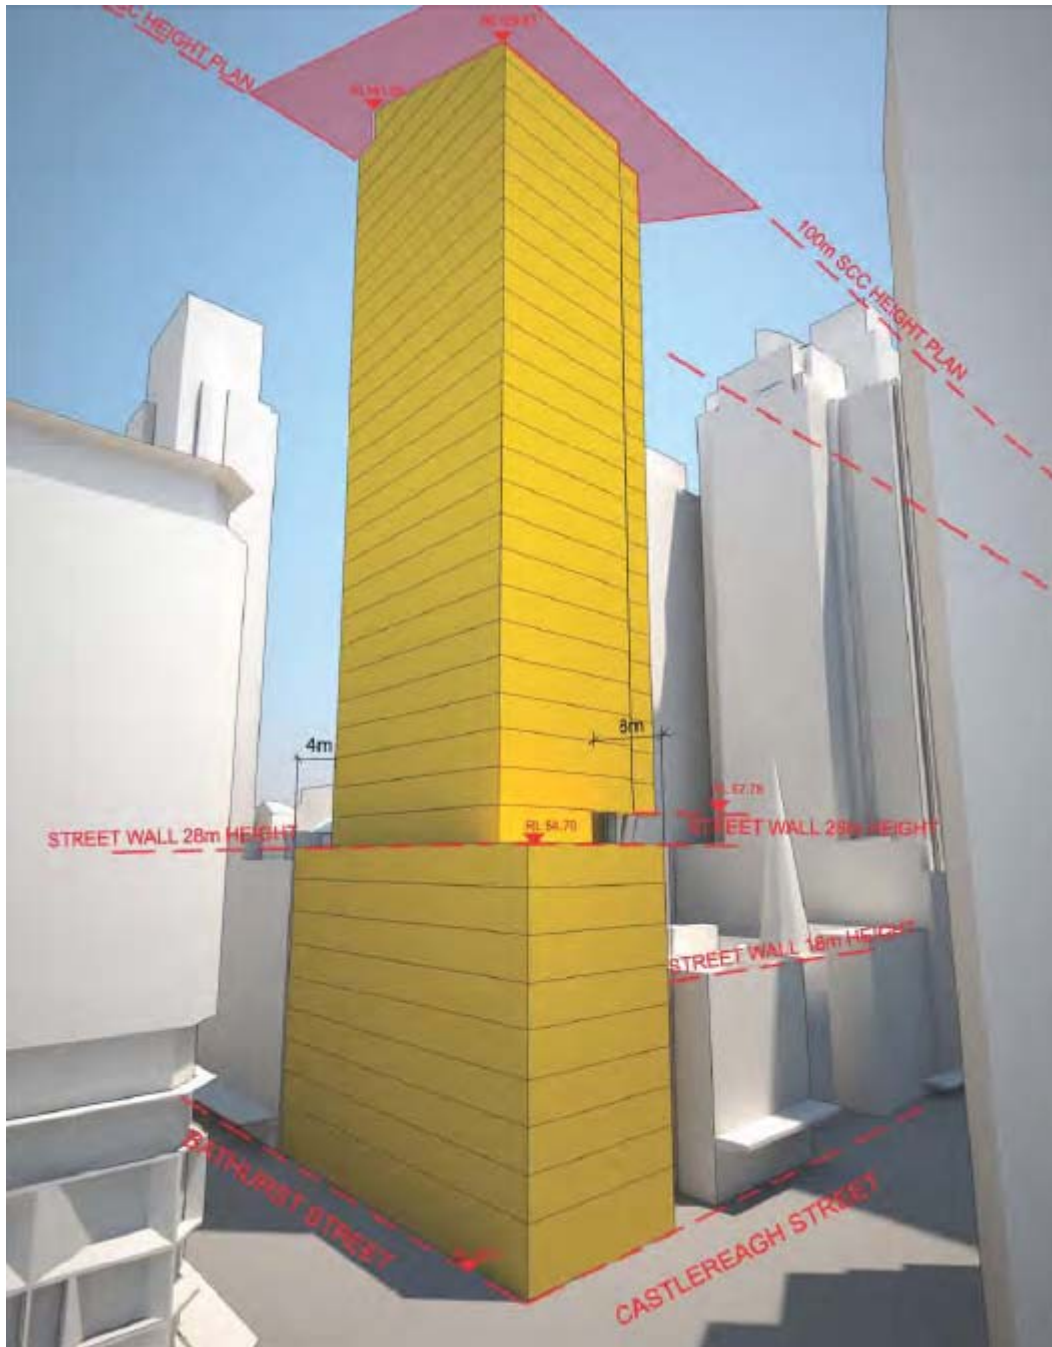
Proposed building envelope, viewed from opposite corner of Bathurst Street/Castlereagh Street intersection.
